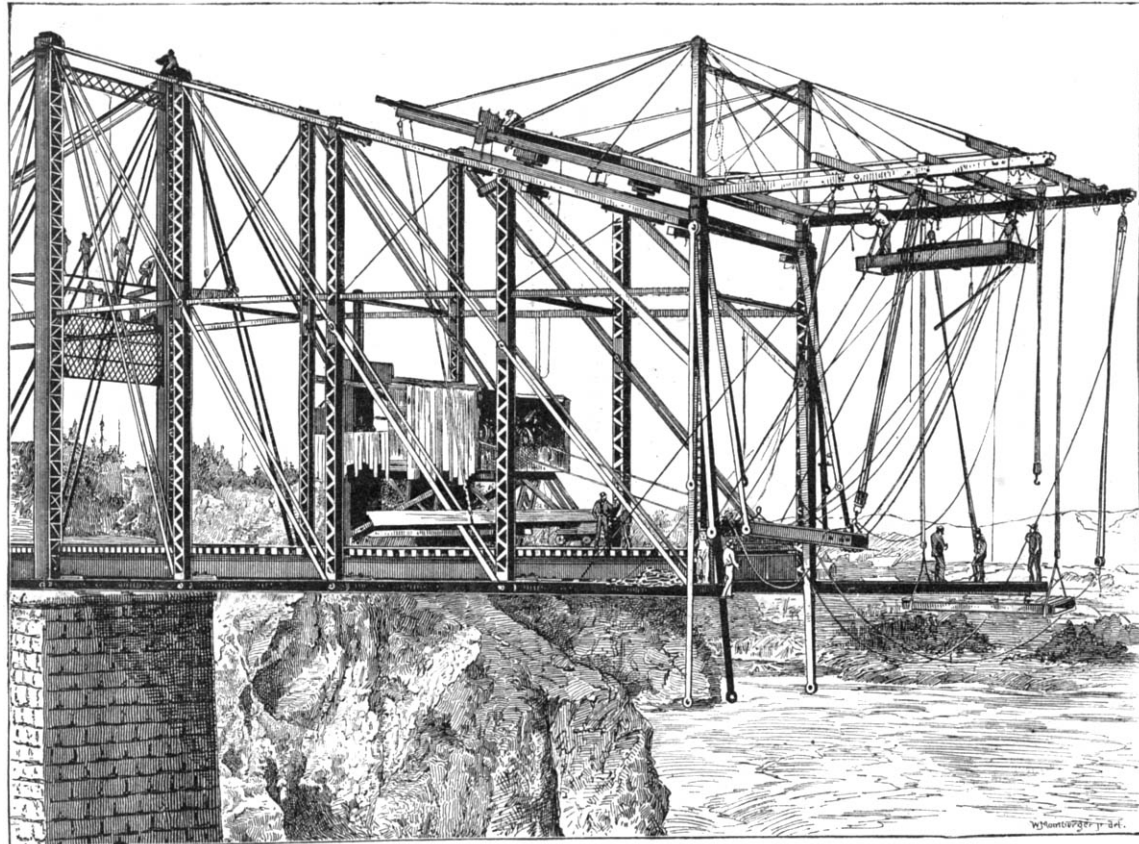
STEEL CANTILEVER BRIDGE AT ST. JOHN.—PROCESS OF ERECTION AND PLANT.
